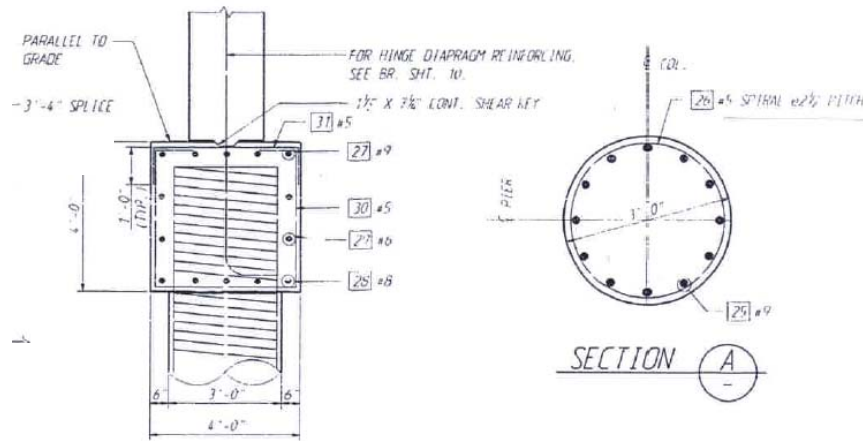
Bridge 405 Column Sections (Crossbeam & Circular column)
